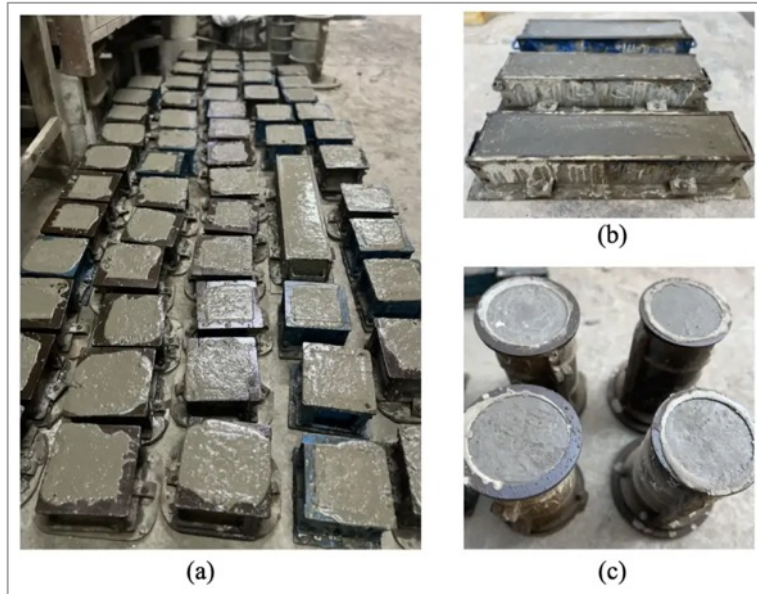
Cast concrete specimens, (a) cubes, (b) prisms, (c) cylinders
